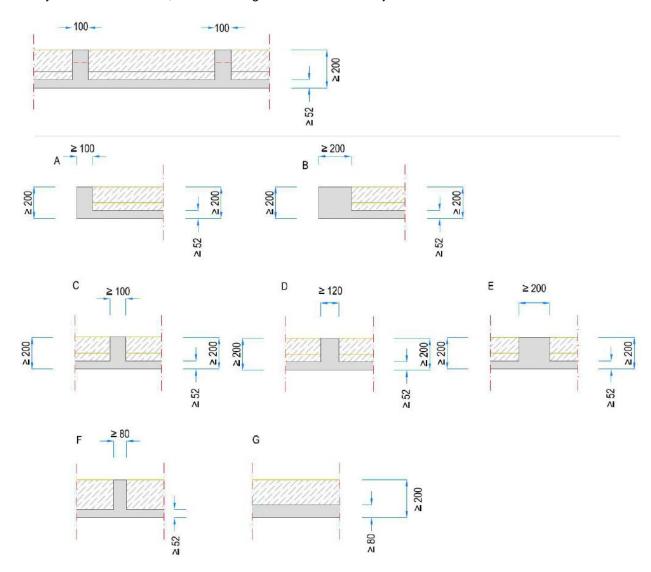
Structural section with insulation between rectangular ribs facing outwards in structural ceiling.
